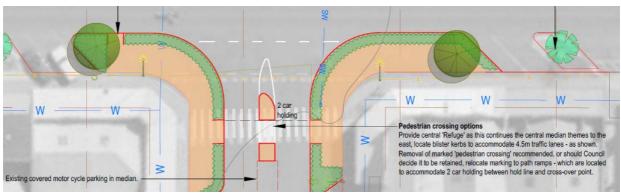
Hill Street Pedestrian refuge cross-over or crossing. Refer Concept Plans Sheet 5 and 9.
